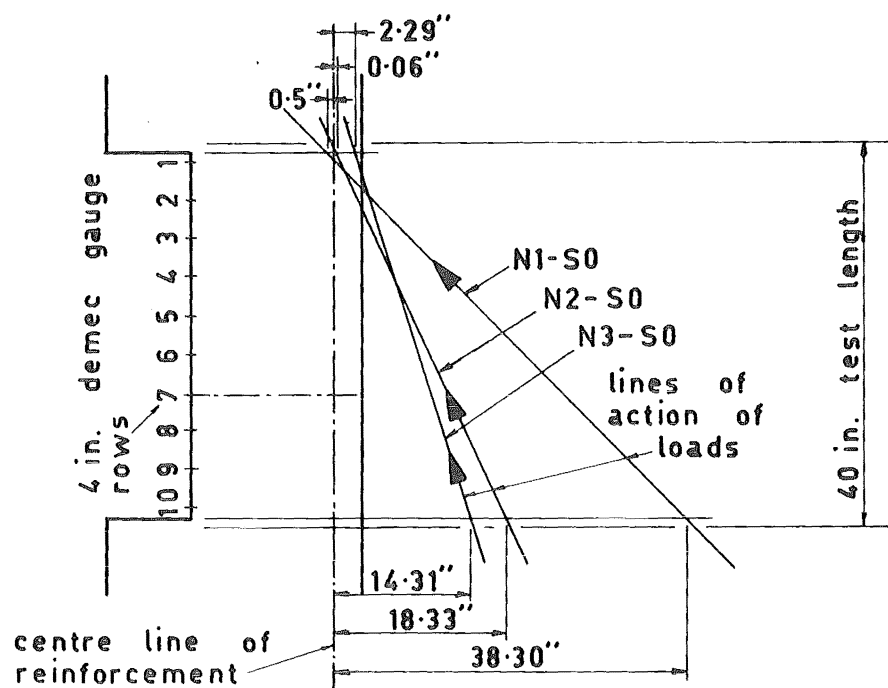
Load Position and 4 inch Demec Gauge Row Position on the Beams Without Stirrups
